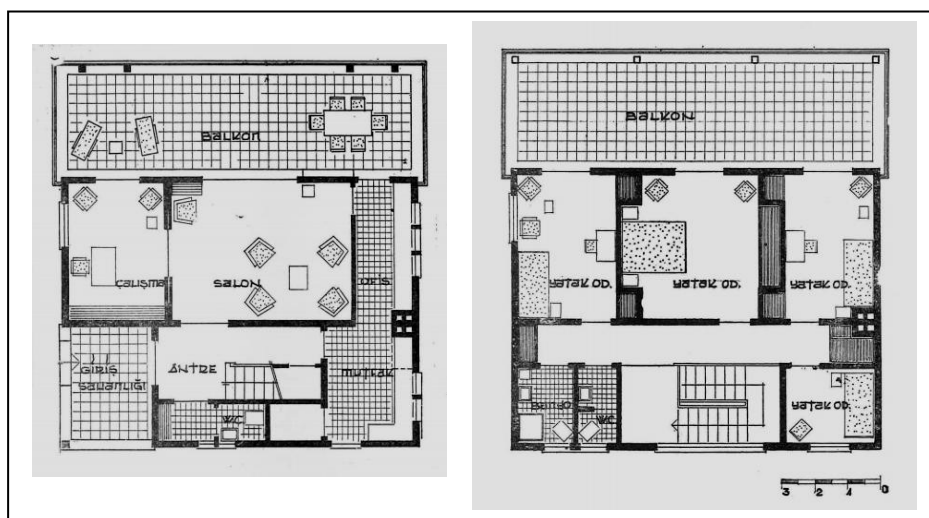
Floor plans of dr. İlhami Masar house, 1963 [150]
